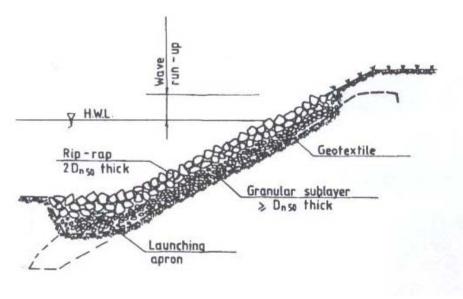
Use of riprap in slope protection (Source: Przedwojski, 1995)
